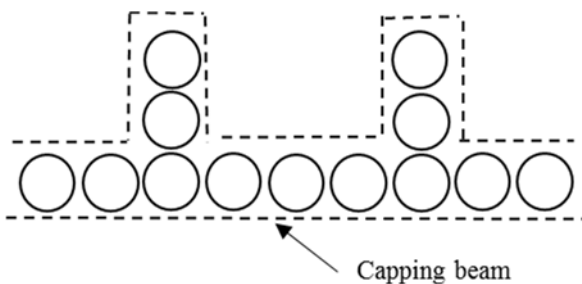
Geometry of buttress wall (600mm CFA piles at 650mm centres)
